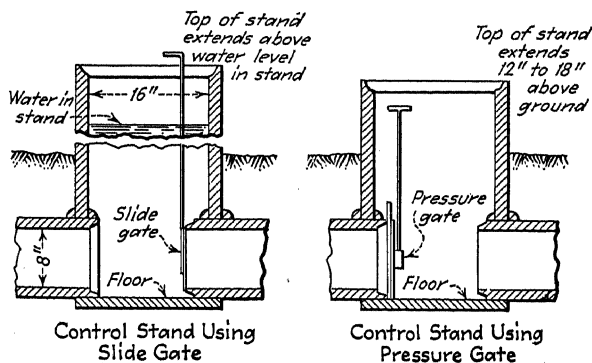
Typical stands used to control flow in concrete-pipe systems.
